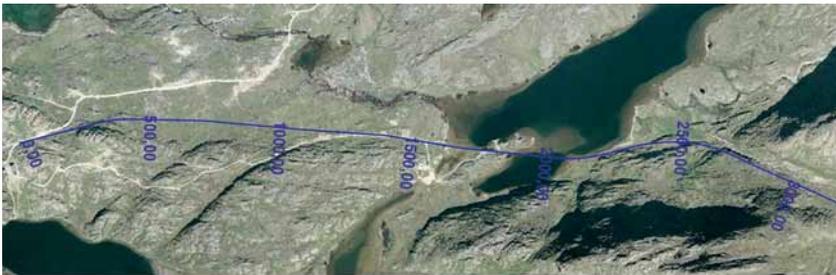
Visualization of the planned road layout showing longitudinal and transverse profiles.
